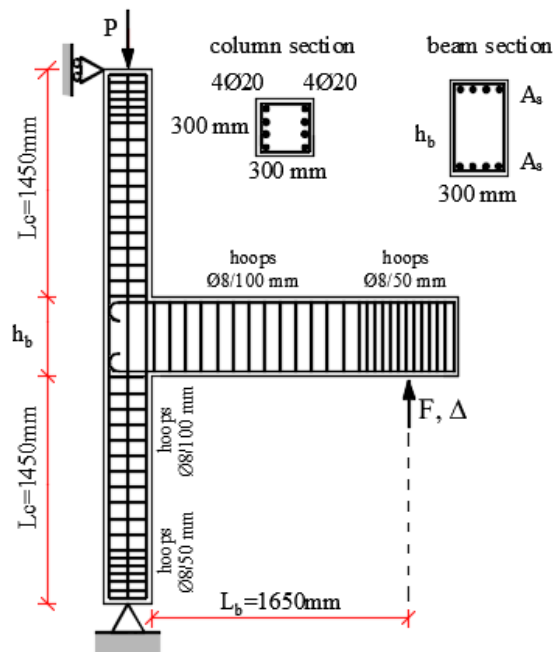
Exterior beam-column joint assemblage tested by [De Risi et al. 2017].
